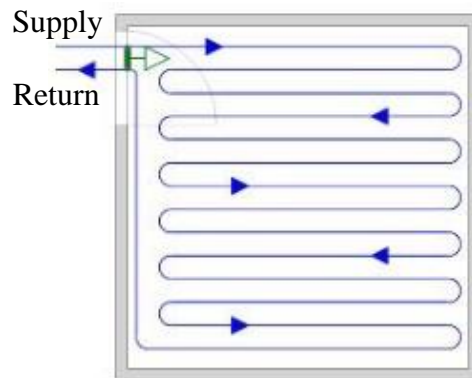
Serpentine Pipe Layout (Central Heating Guide,2019)
